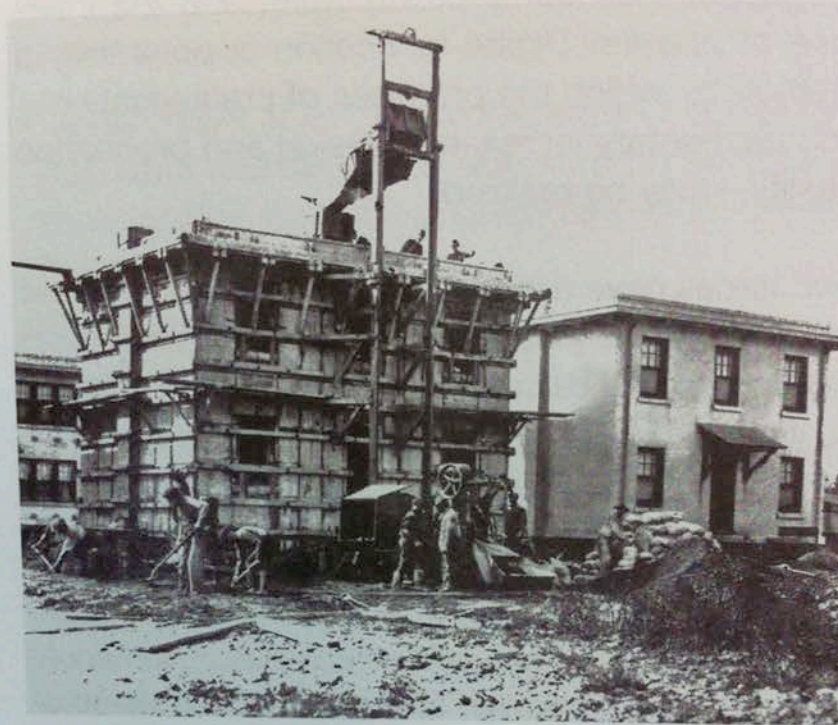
Edison's 1908 single-pour concrete system was deployed as a fast and affordable housing option. Using elaborate cast iron formwork and machinery allowed for up to three-story houses to be cast in a single pour. The iron formwork proved cumbersome and difficult. It was not until Charles Ingersoll, a wealthy New Jersey manufacturer who brought the idea of making the forms out of wood, that Edison's single-pour concept was built. Construction began in 1917 in Union, New Jersey. Fewer than 100 houses were actually realized.
